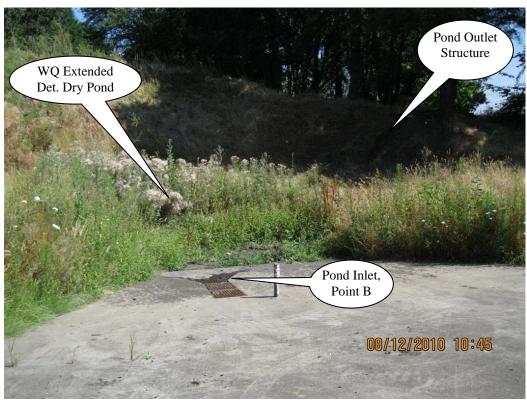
This photo is taken from near the water quality manhole (DFI D00288) looking into the extended det. dry pond.
